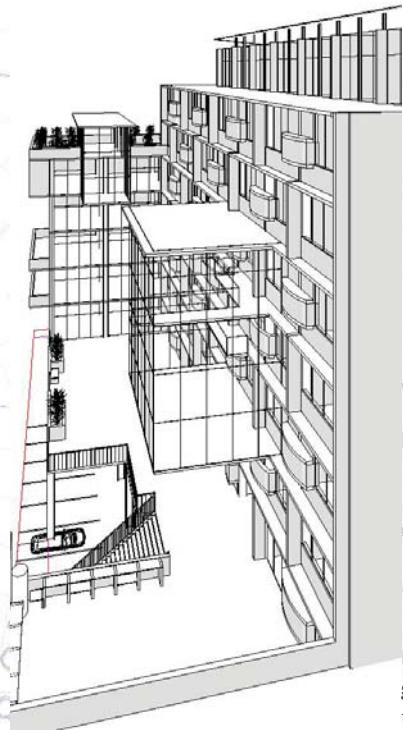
The new glass gallery box protrudes from the existing façade
